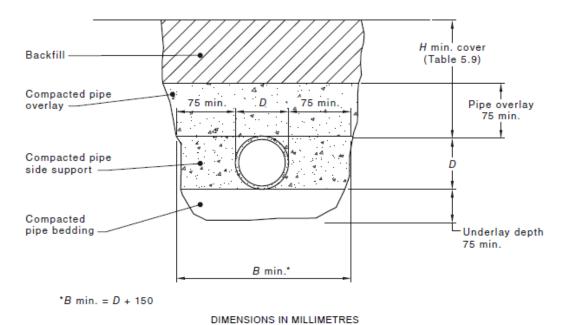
Table 5.10 from AS3500.1:2015, Typical trench installation
